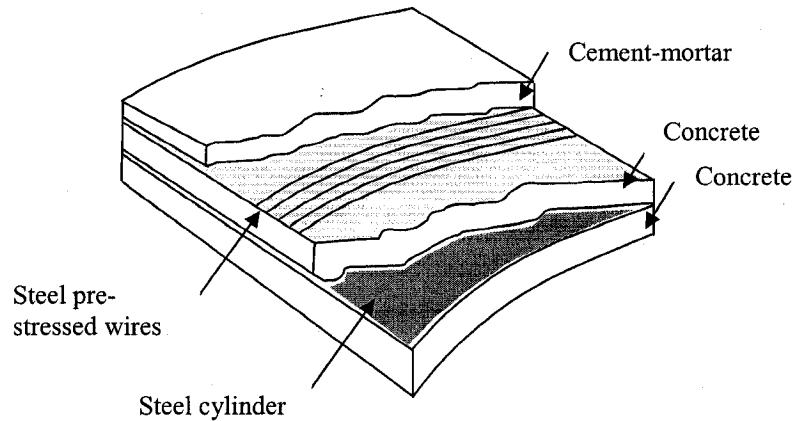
Pre-stressed Concrete Cylinder Pipe (PCCP)
